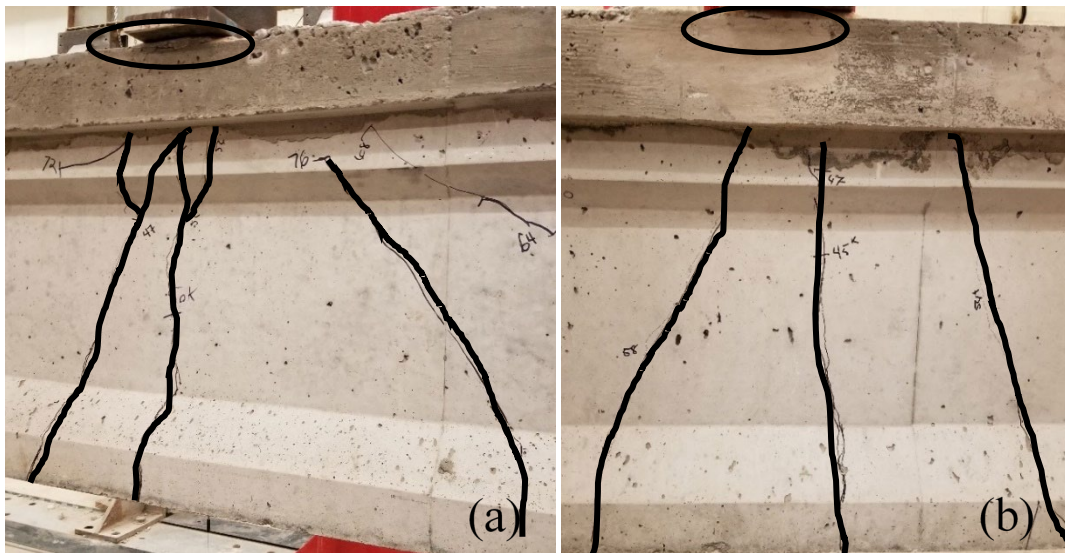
Crushed deck concrete in the RC1-N (a) and RC1-S (b) girders is indicated by a black oval, and the final flexural cracking under the load point in the RC1-N (a) and RC1-S (b) girders is indicated by dark lines.
